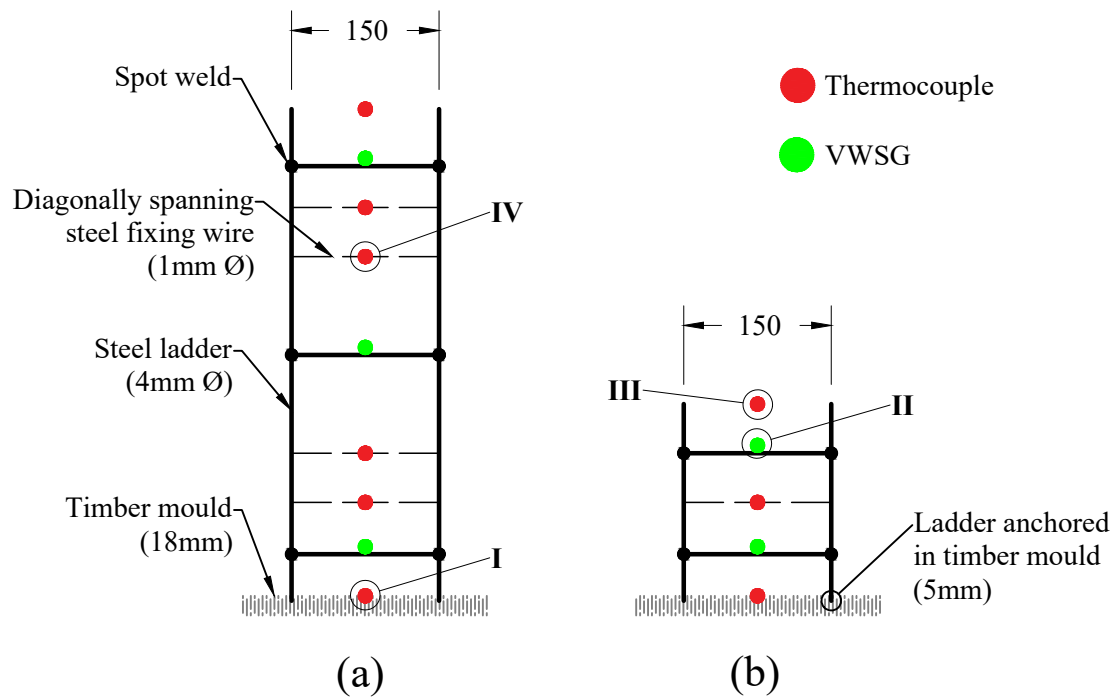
Layout of instrumentation ladders showing (a) the Cube and L-Shape Cube layout, and (b) Flange and L-Shape Flange layout
